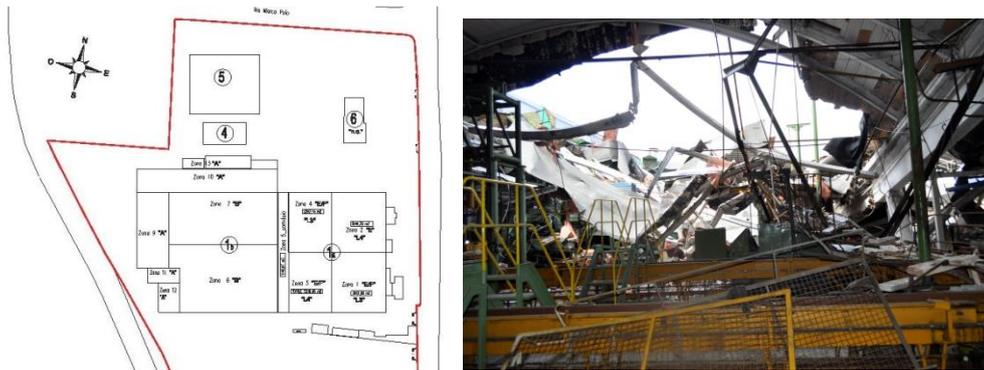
Collapse of structures of manufacturing buildings in Matelica, Italy (2016)
